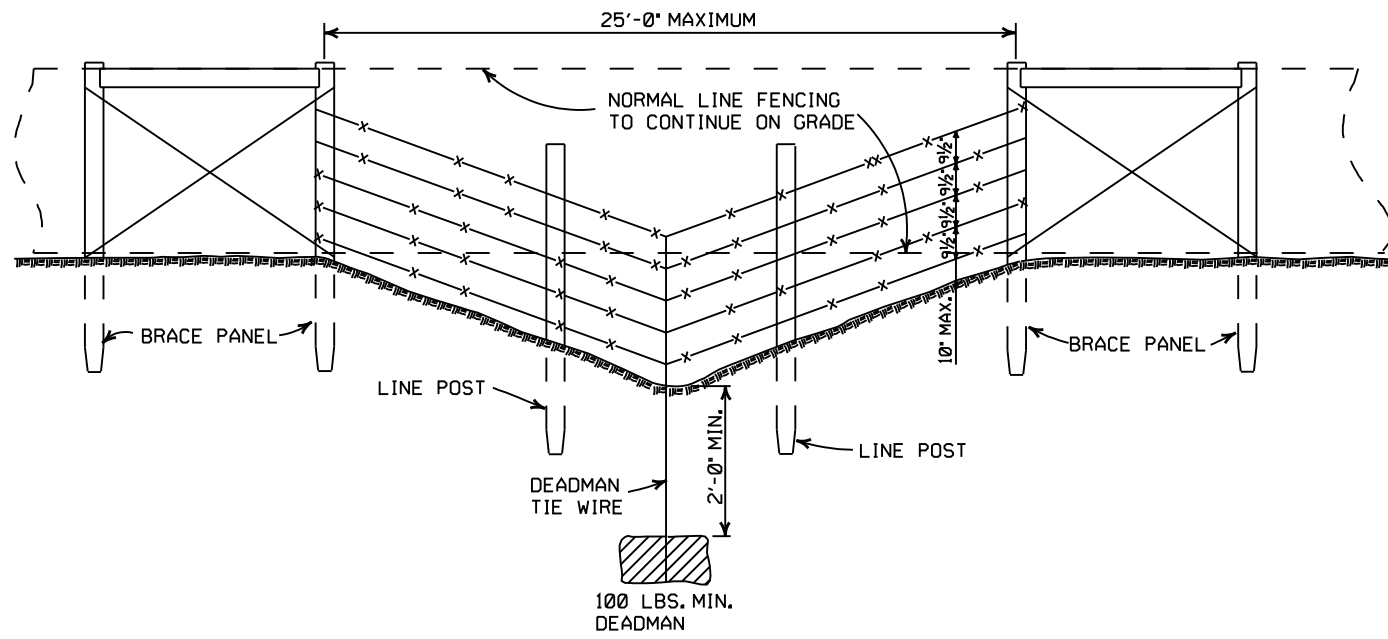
DETAIL OF FENCE CONSTRUCTION AT LARGE CULVERTS (5' IN HEIGHT AND OVER)
